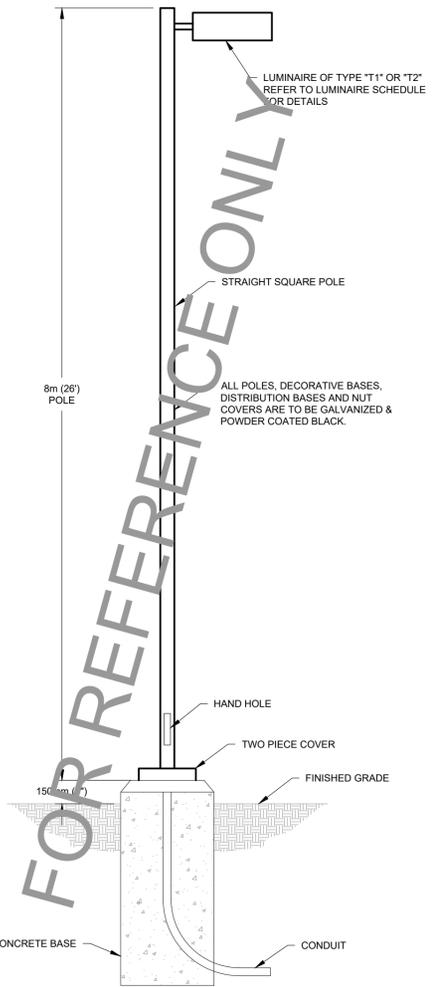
POLE LUMINAIRE FIXTURE TYPE "S + T" MOUNTING DETAIL
